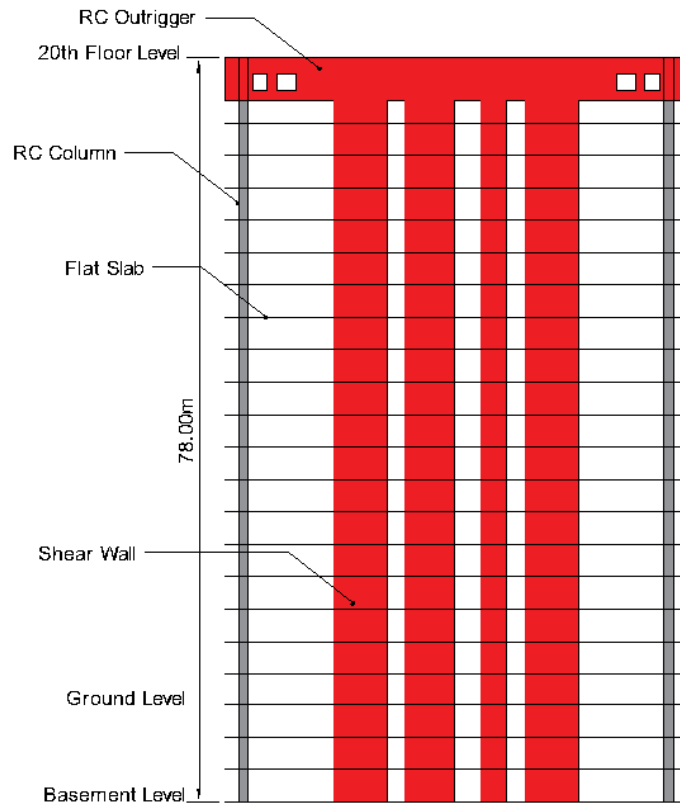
Proposed location and configuration of reinforced concrete outriggers
